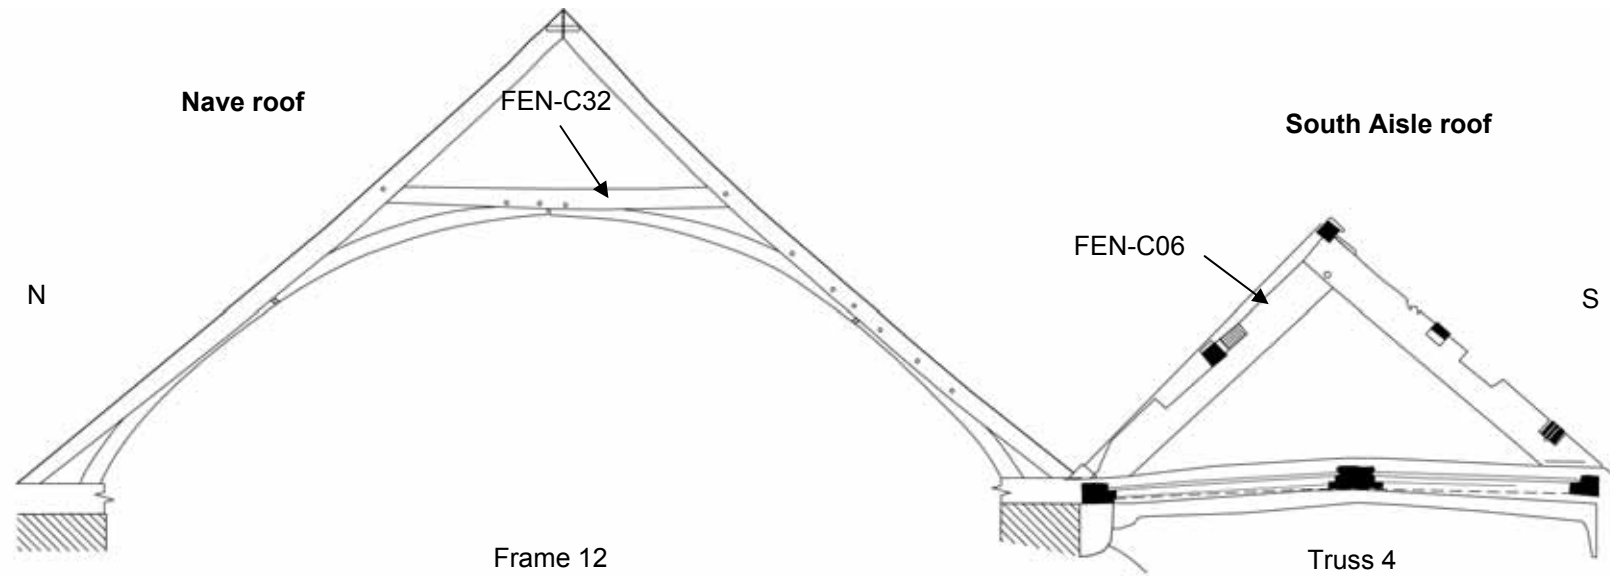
Section through the nave and south aisle roofs, showing the location of samples FEN-C06 and FEN-C32 (provided by John Allen)
